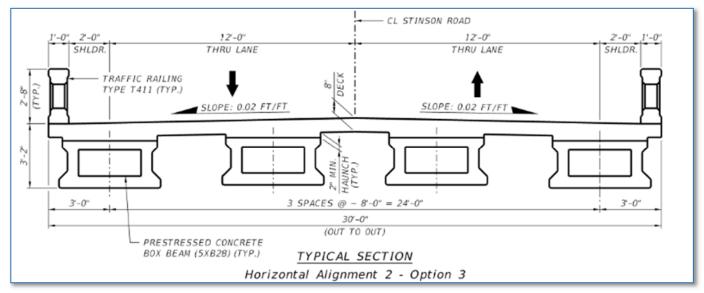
TxDOT Prestressed Concrete XBeams (5XB28) Typical Section
